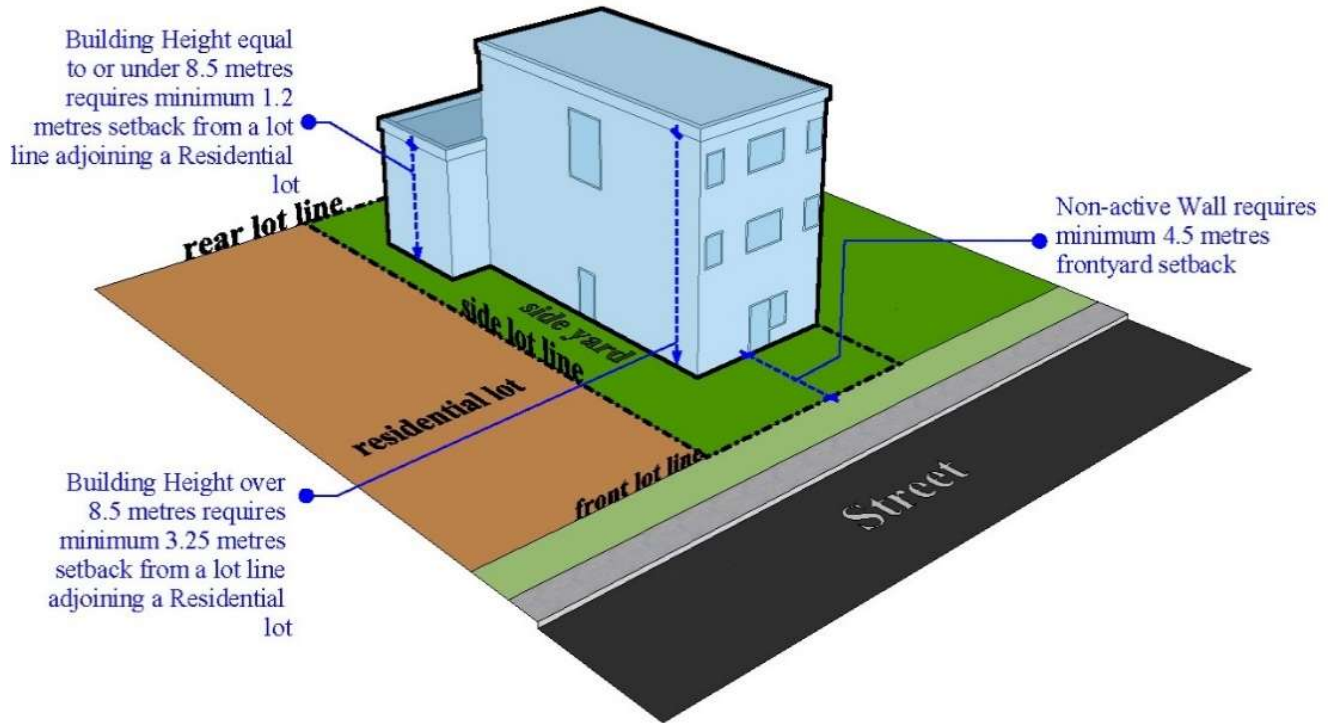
A.F2: Mixed Low-Rise Zone Non-Active Wall
